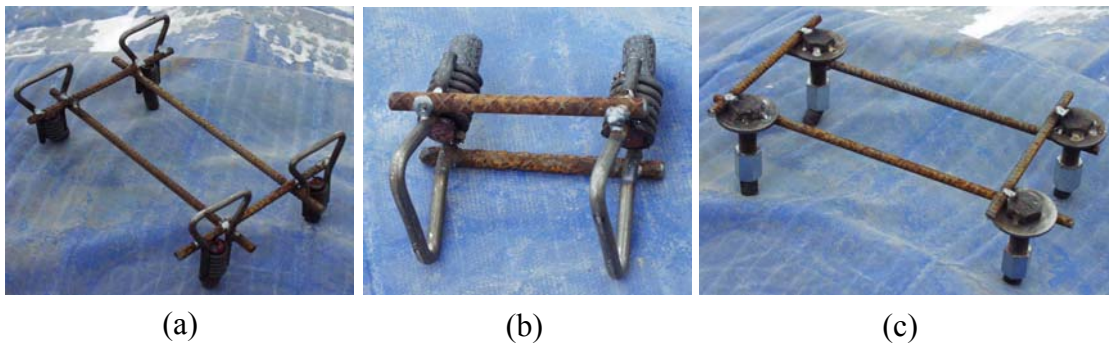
Steel inserts to be placed in girder segments: (a) loop inserts to be placed in girder web; (b) loop inserts to be placed in girder flange; (c) bolt insert to be placed in girder web.
